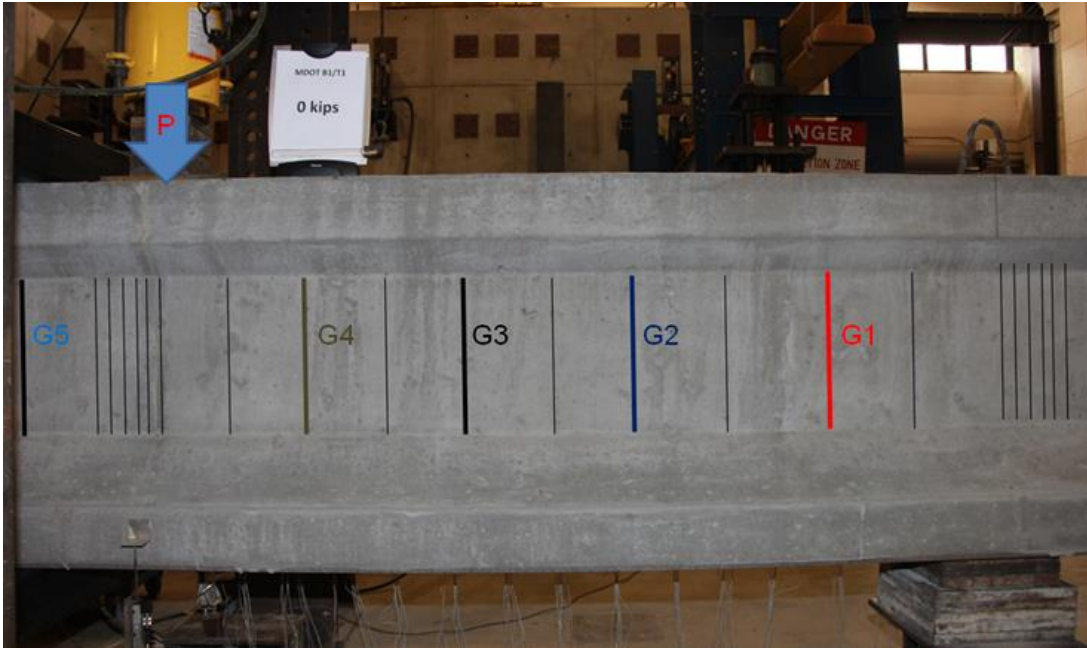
Girder 1- Test 1 stirrups strain gauges locations
